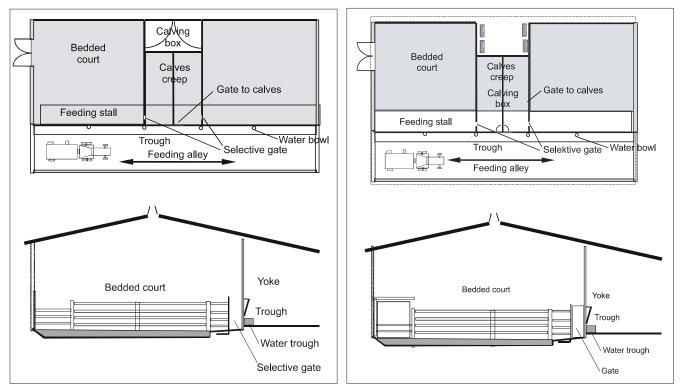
Layout and cross section from a bedded house with straw yards and calves creeps between cow pens
